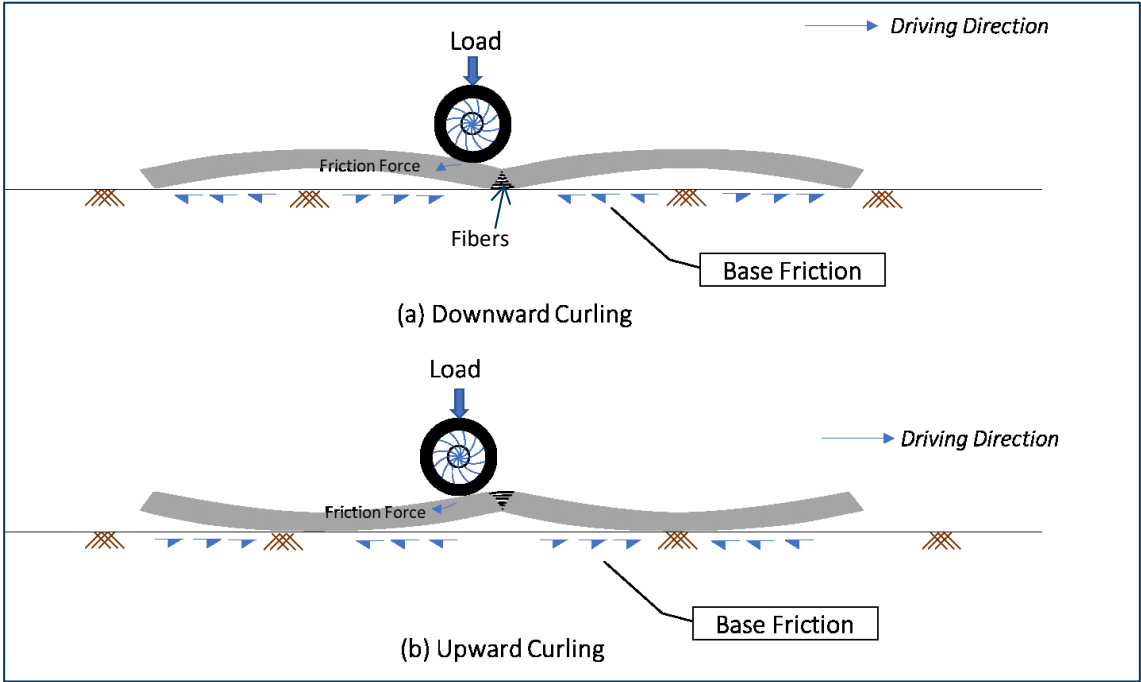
Key forces on the transverse joints of a thin FRC pavement (a) downward curling, (b) upward curling.
